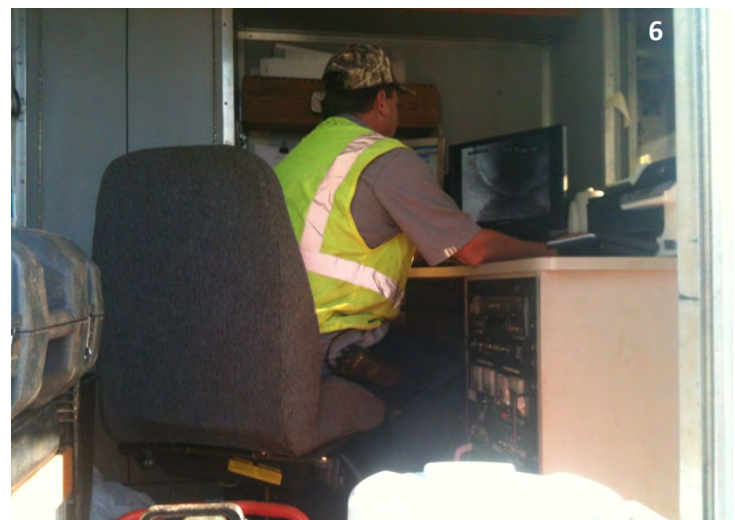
ACC Stormwater worker uses a camera to find the exact location and extent of the two damaged sewage pipes
